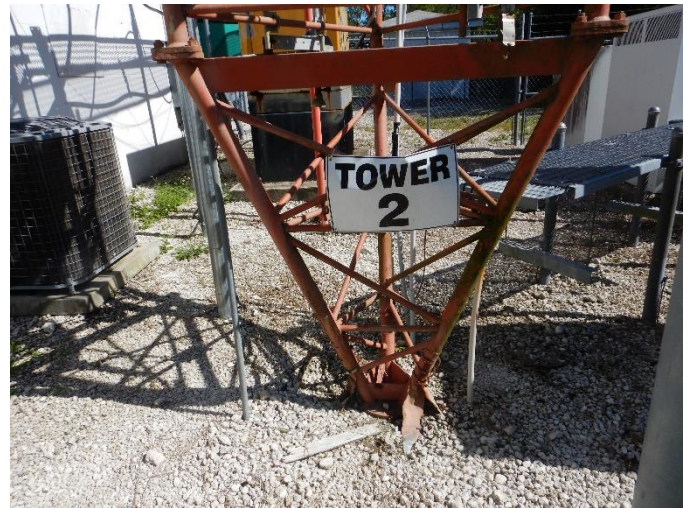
Photograph of the tower where concrete foundation is submerged within the soil
